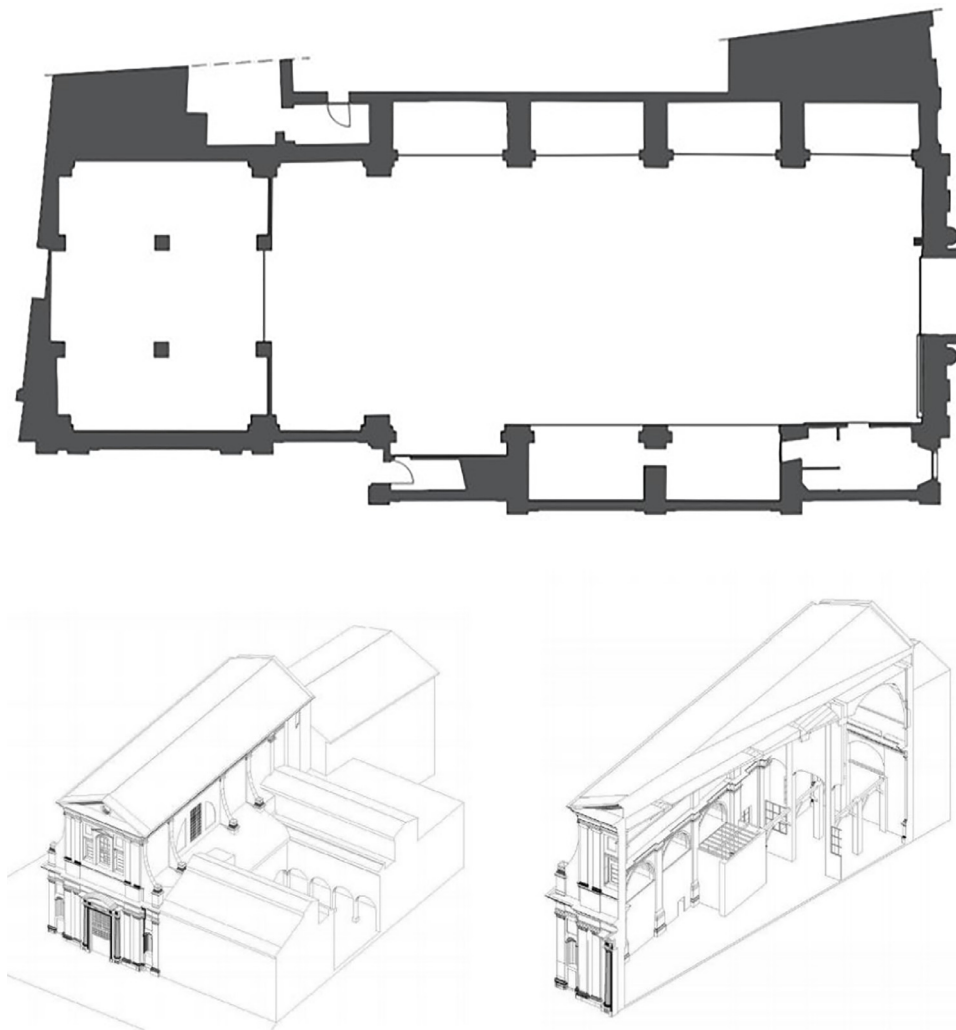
Plan (up) and isometric views (down) of the building. Source: Authors' own elaboration.
